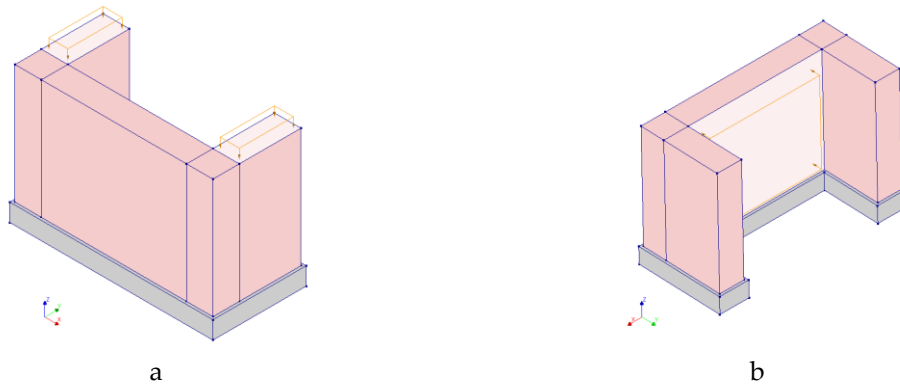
Loads applied to the walls – (a) Roof load to the lateral walls, and (b) Pushover load to the frontal wall
